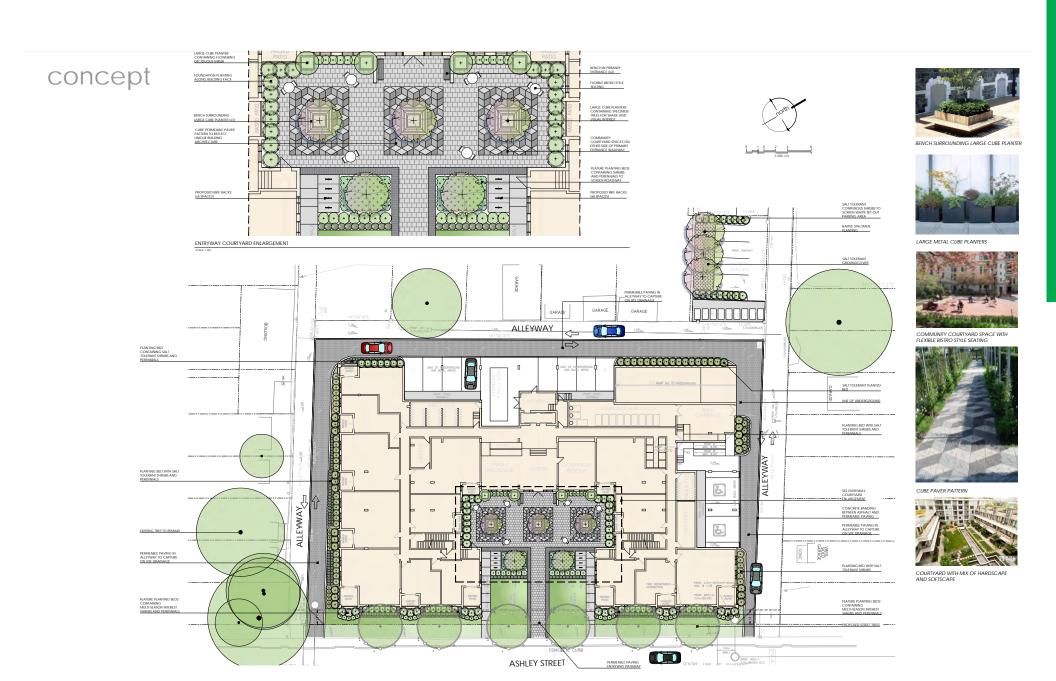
Landscape Concept Plan prepared by Adesso Design Inc.
